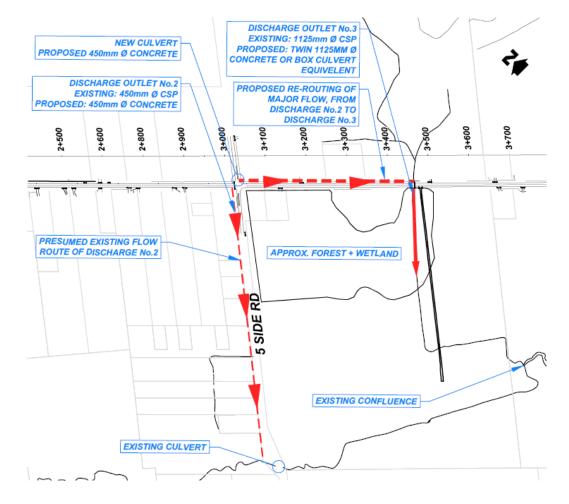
Downstream Flow Routes from of Culverts at 3+056 and 3+498
